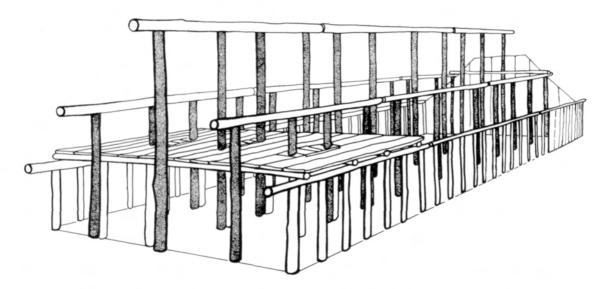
Reconstructed internal structure of a Bandkeramik longhouse (Type 1) with storage floor in the south-east section
